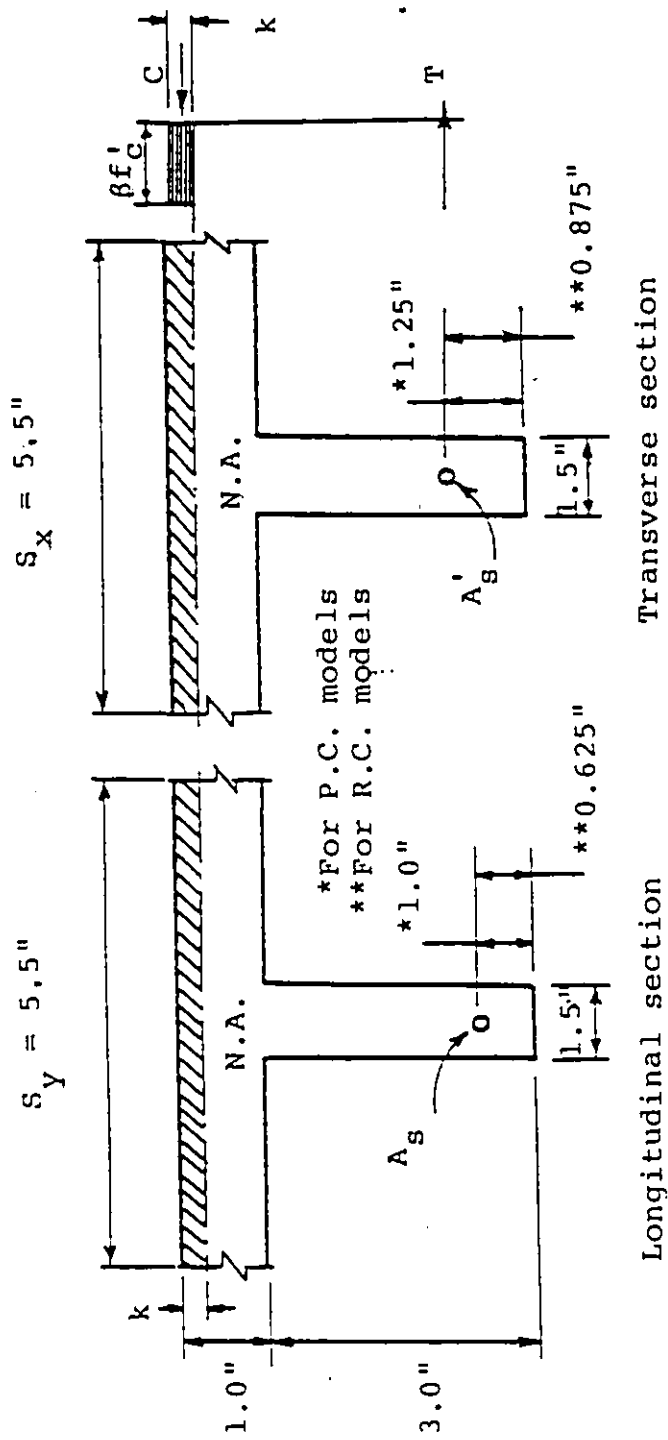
CRACKED SECTIONS OF WAFFLE SLAB
